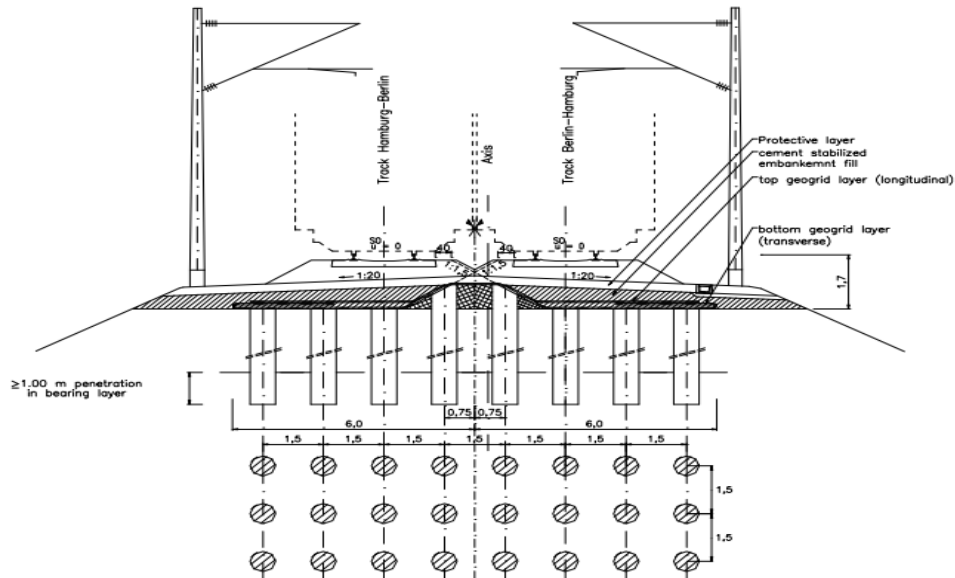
Foundation system at section of Büchen-Hamburg (after Schwarz et al., 2005)
